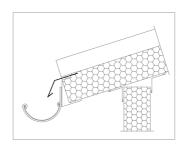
Ob-18 flashing "Gutter flashing for Ob-19"
